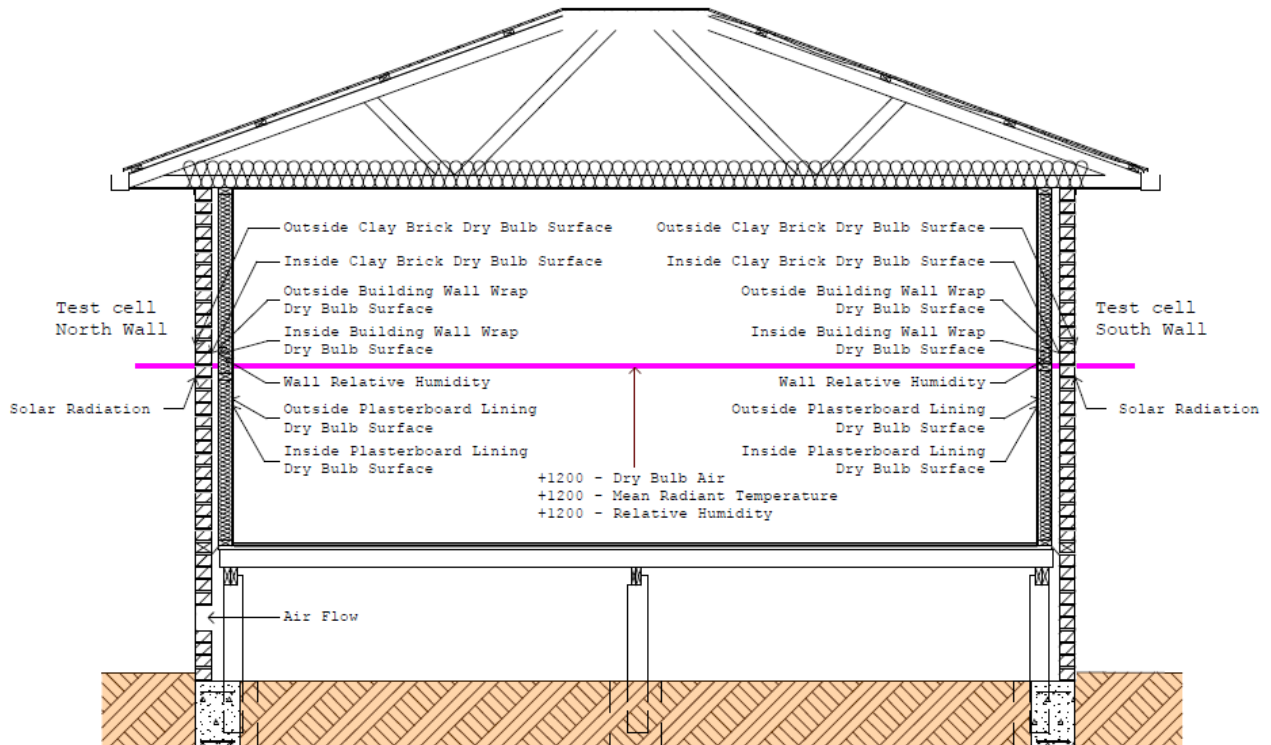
Horizontal measurement profile for the enclosed-perimeter platform floored test cell
